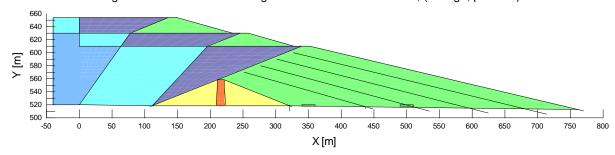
Construction of tailings dam to elevation 654 masl, (II stage, phase 2)
